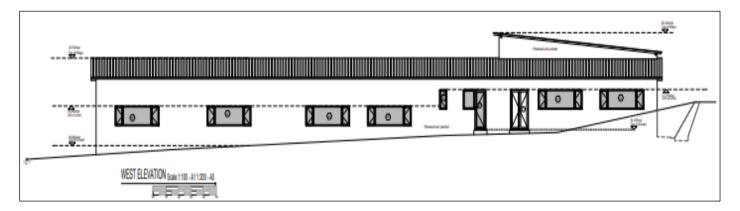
West elevation of the proposed new garages (TMBA, 2023)
